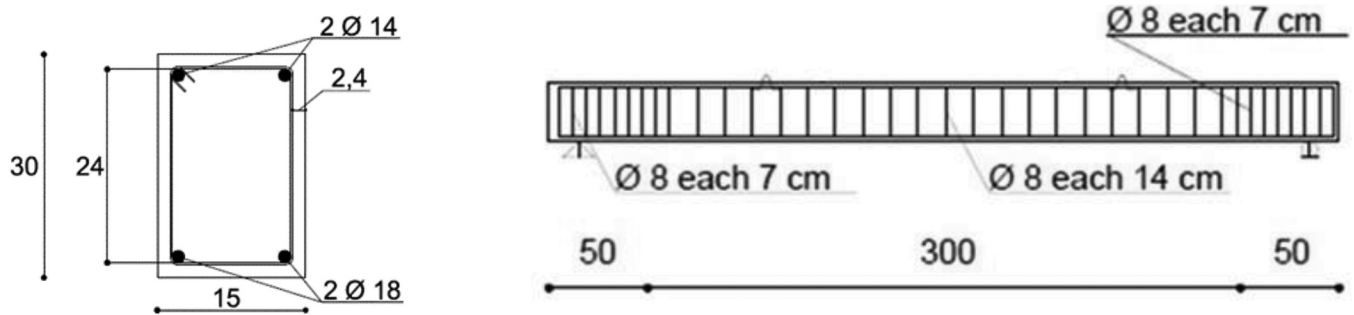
Steel reinforcements: (a) cross section; and (b) longitudinal profile of beams.
